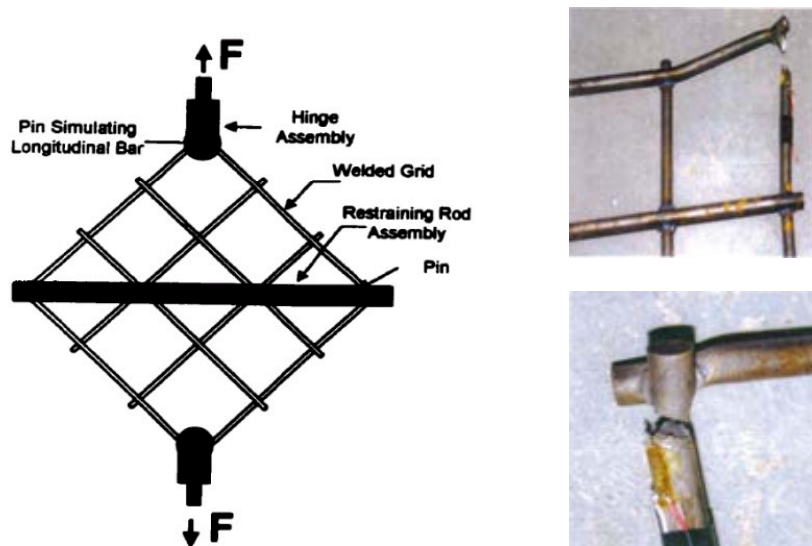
Burst tests of BauGrid WWR used in column tests with failure by rupturing of wire outside the weld [4, 5, 9].
